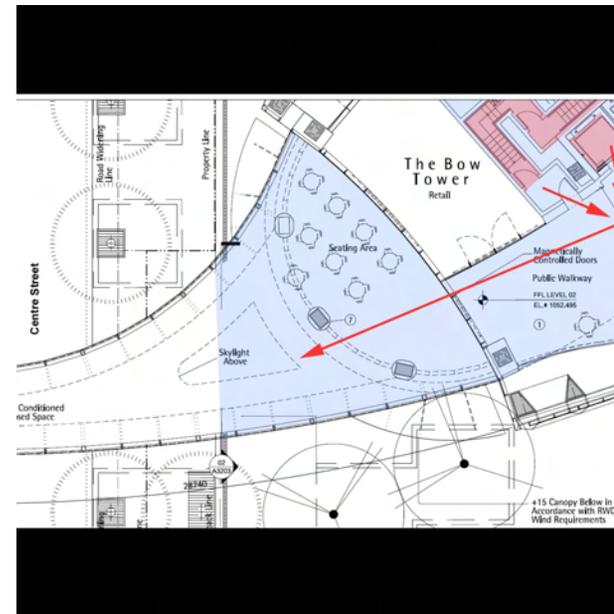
Example of an innovative approach to bridge and walkway design as public space (Sturgess Architecture).
